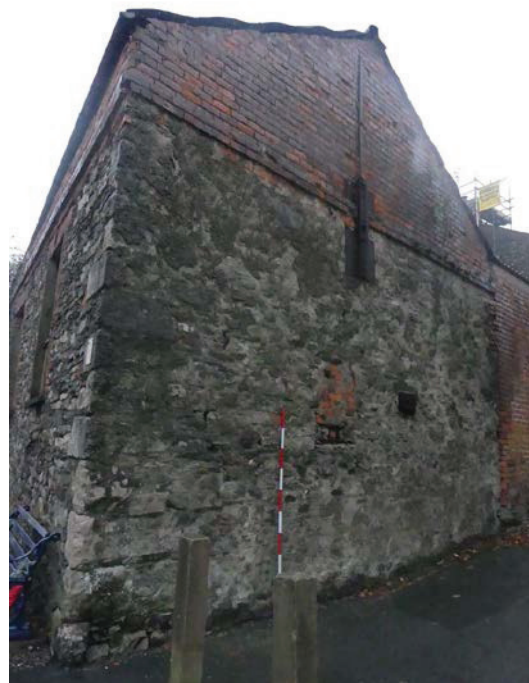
(right): The south-west side of the south-east external elevation, viewed from the south
